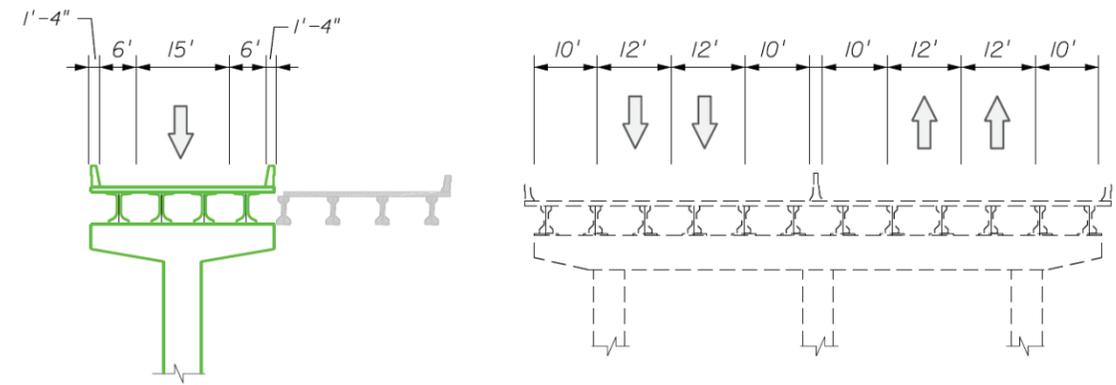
Bridge Over SW 88<sup>th</sup> Street/Kendall Drive - Remaining Bridge Removal
